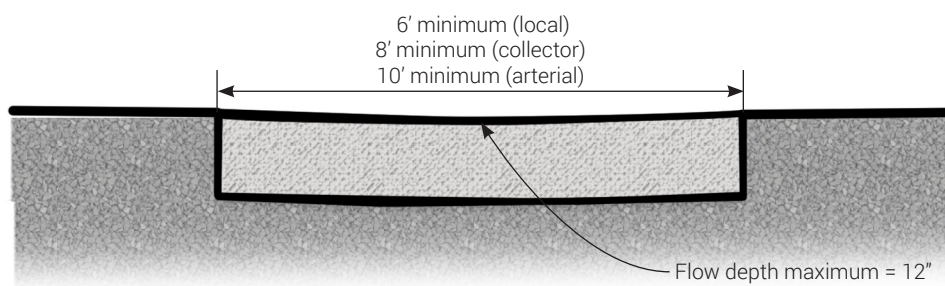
TYPICAL SECTION FOR VALLEY GUTTER
